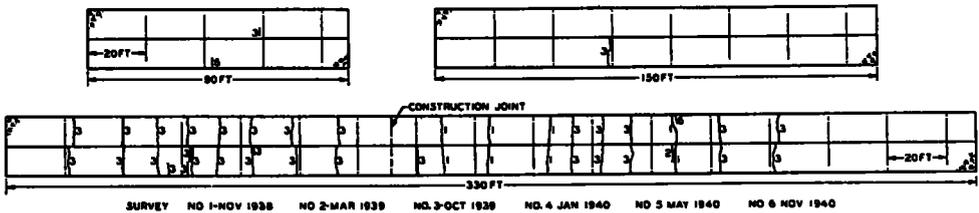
Typical crack survey sheet for intermediate length sections reinforced with 1/2-inch diameter steel. Sections placed September-October, 1938
